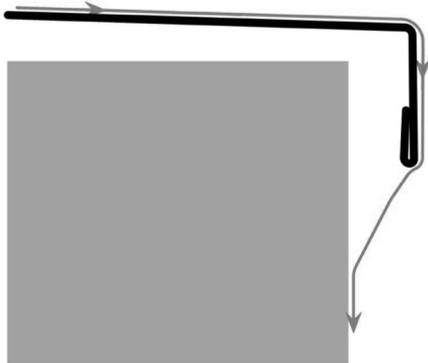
DRAWING OF OBSERVED DRAINAGE
